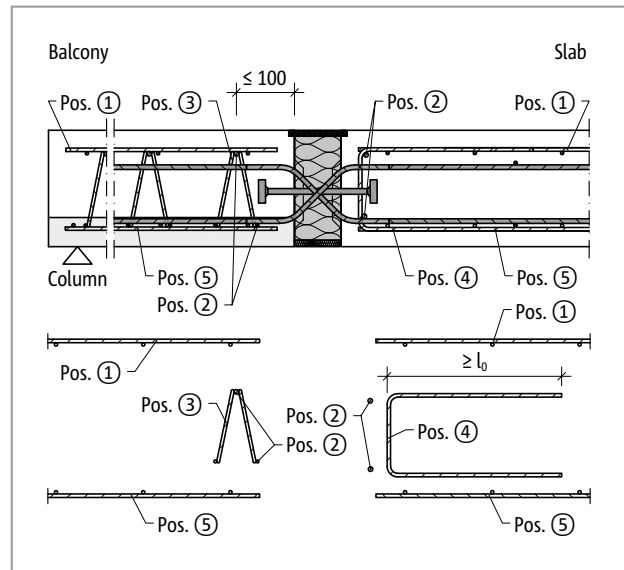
Schöck Isokorb® T type Q-P-VV: On-site reinforcement, balcony side with lattice beam
